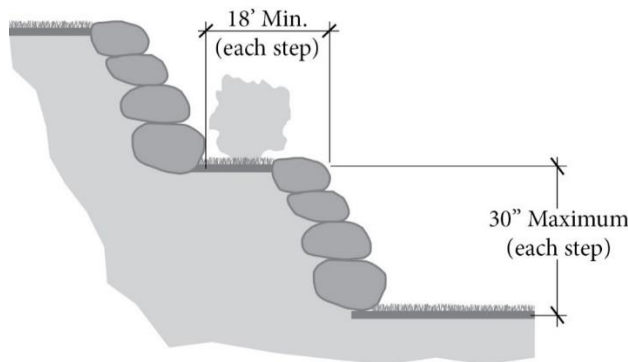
c. Allowable terrace configuration for wall or rockery adjacent to a public sidewalk. Note that this illustration shows a stone wall, but other masonry and concrete walls are acceptable as well.
